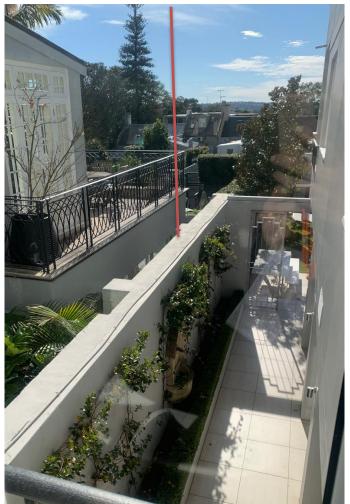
View from No.146 dining area (standing position) Source: Assessment Officer Site Photo
